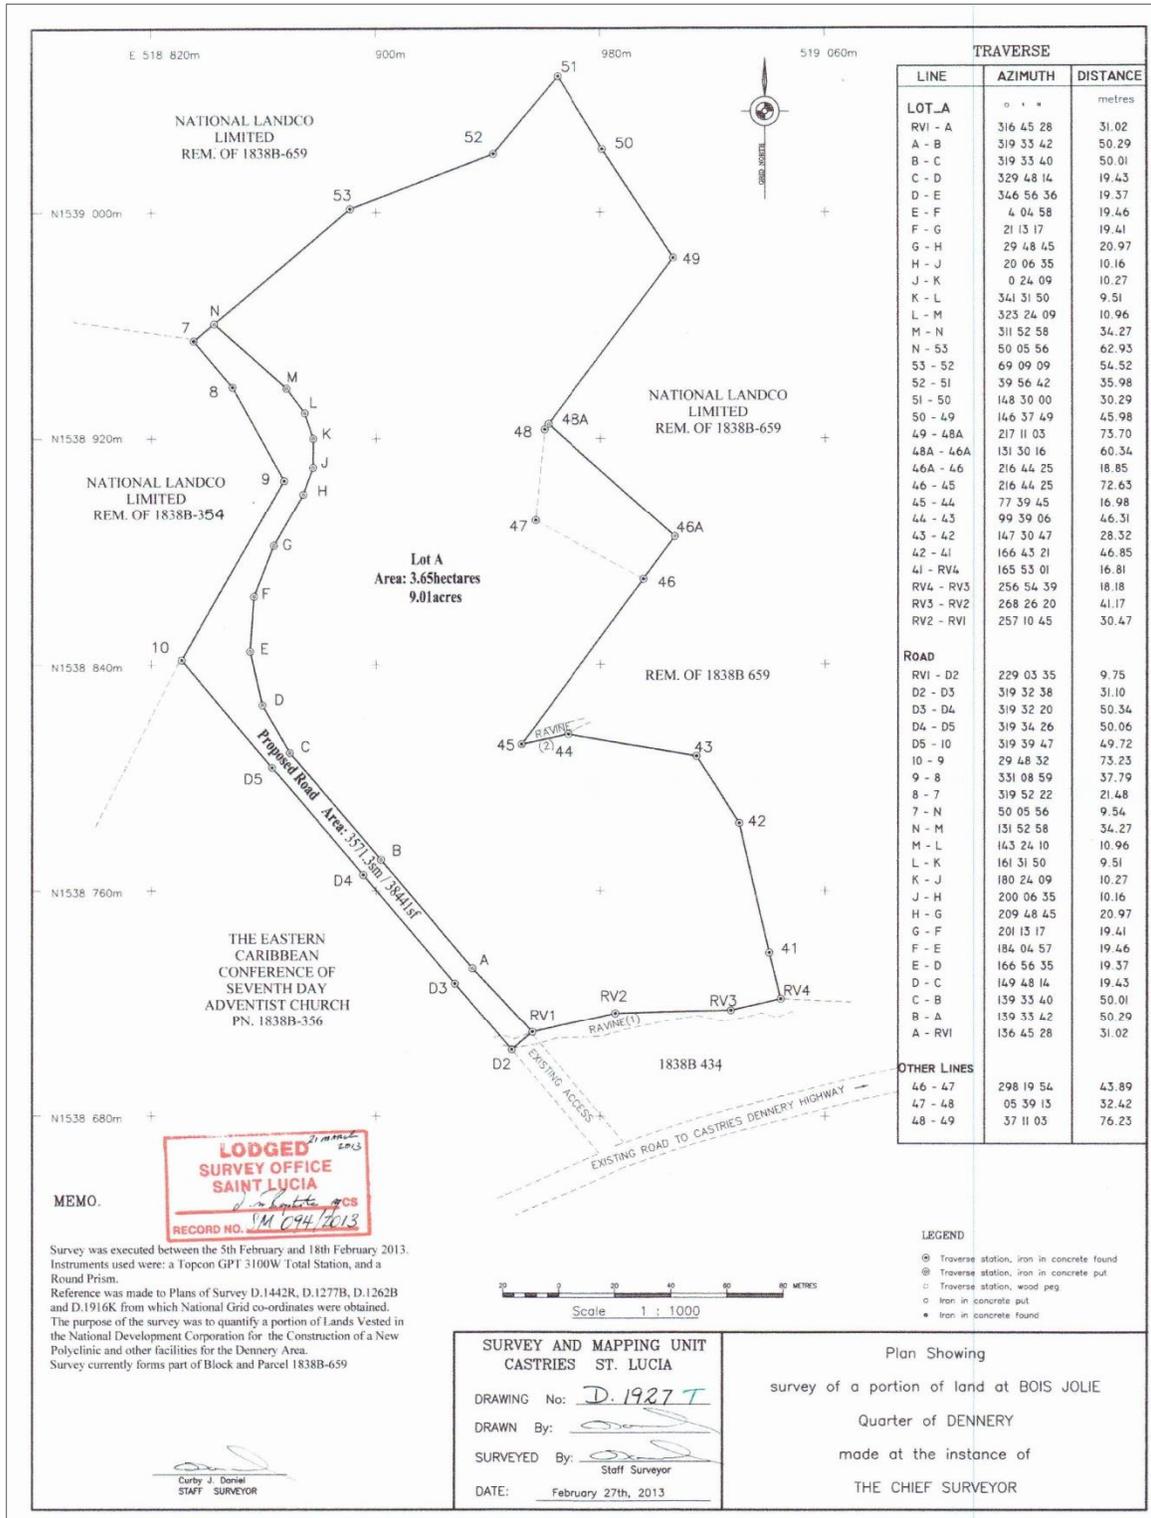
Revised Site and Location Plan for Dennery Polyclinic
